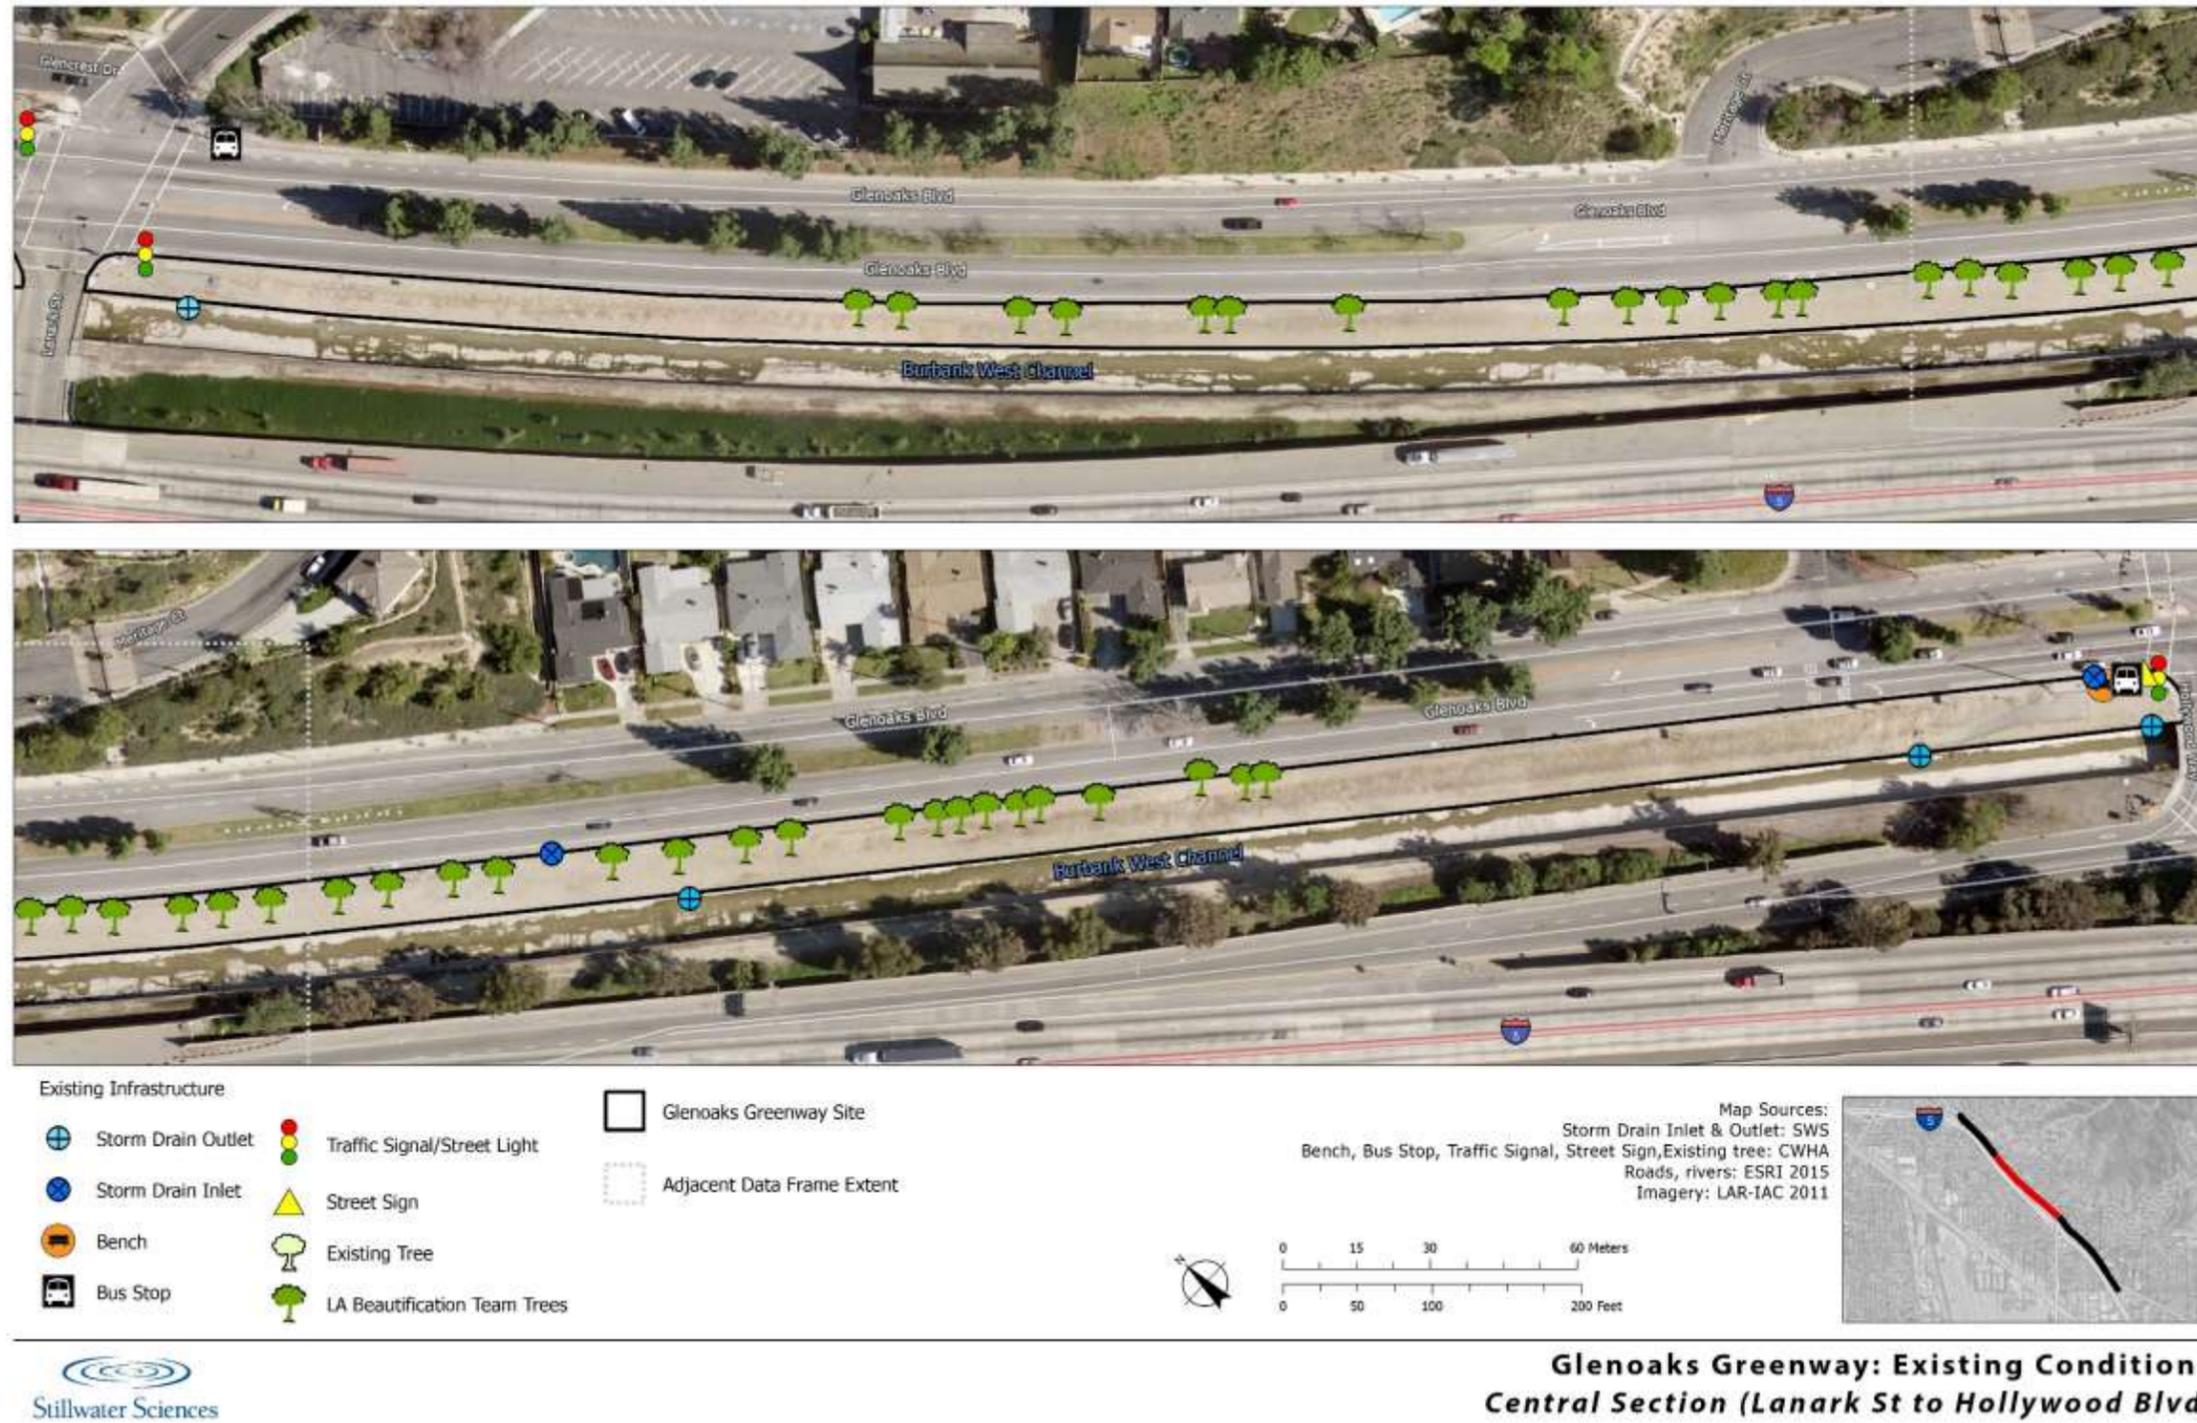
Central section of Glenoaks Greenway existing conditions overview.
